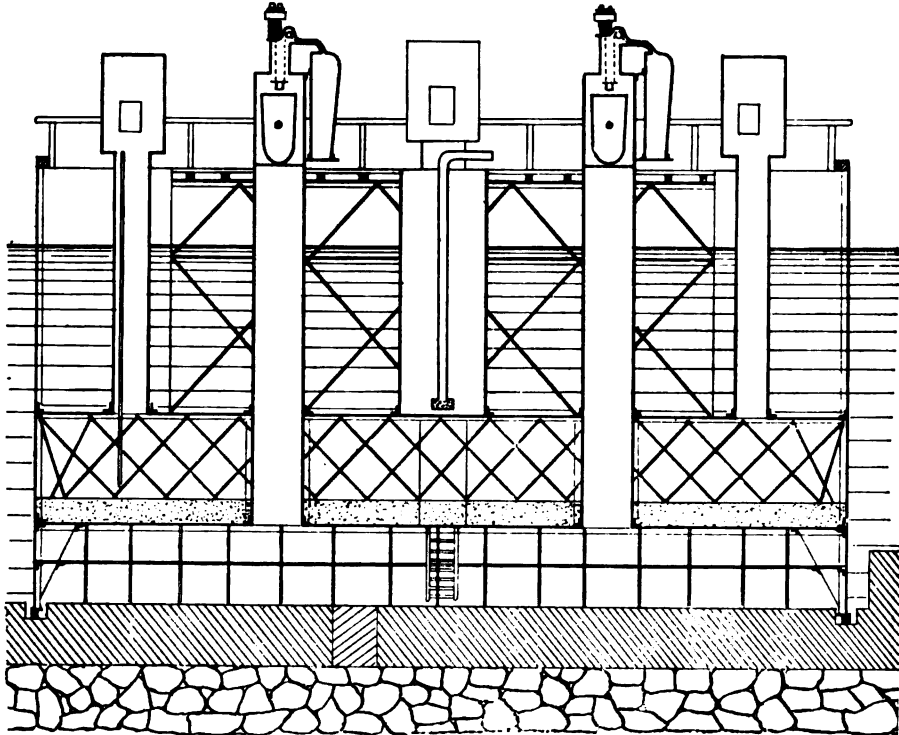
Longitudinal Section of Caisson at Marseilles.
